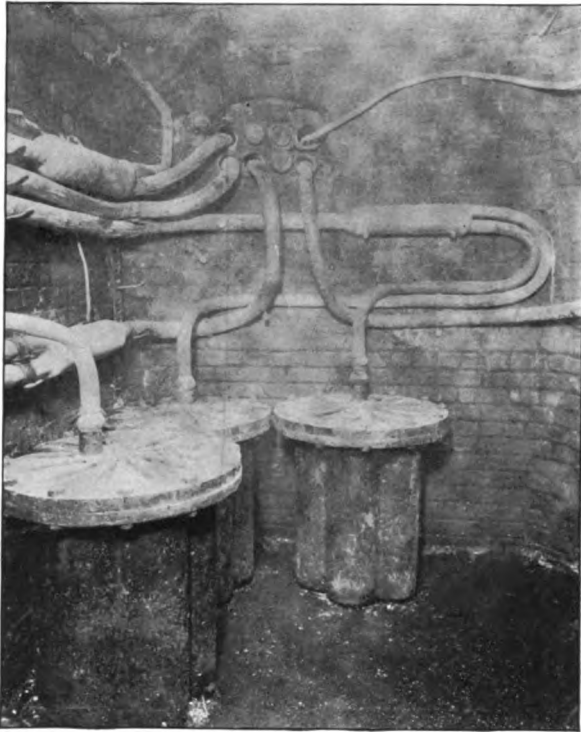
Underground Manhole showing Pots containing Loading Coils, and connections from coils to cables
